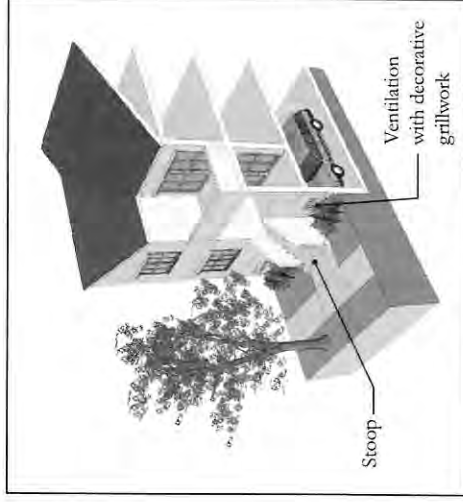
Semi-depressed parking should be screened with architectural elements that enhance the streetscape such as stoops, porches, or balcony overhangs.
